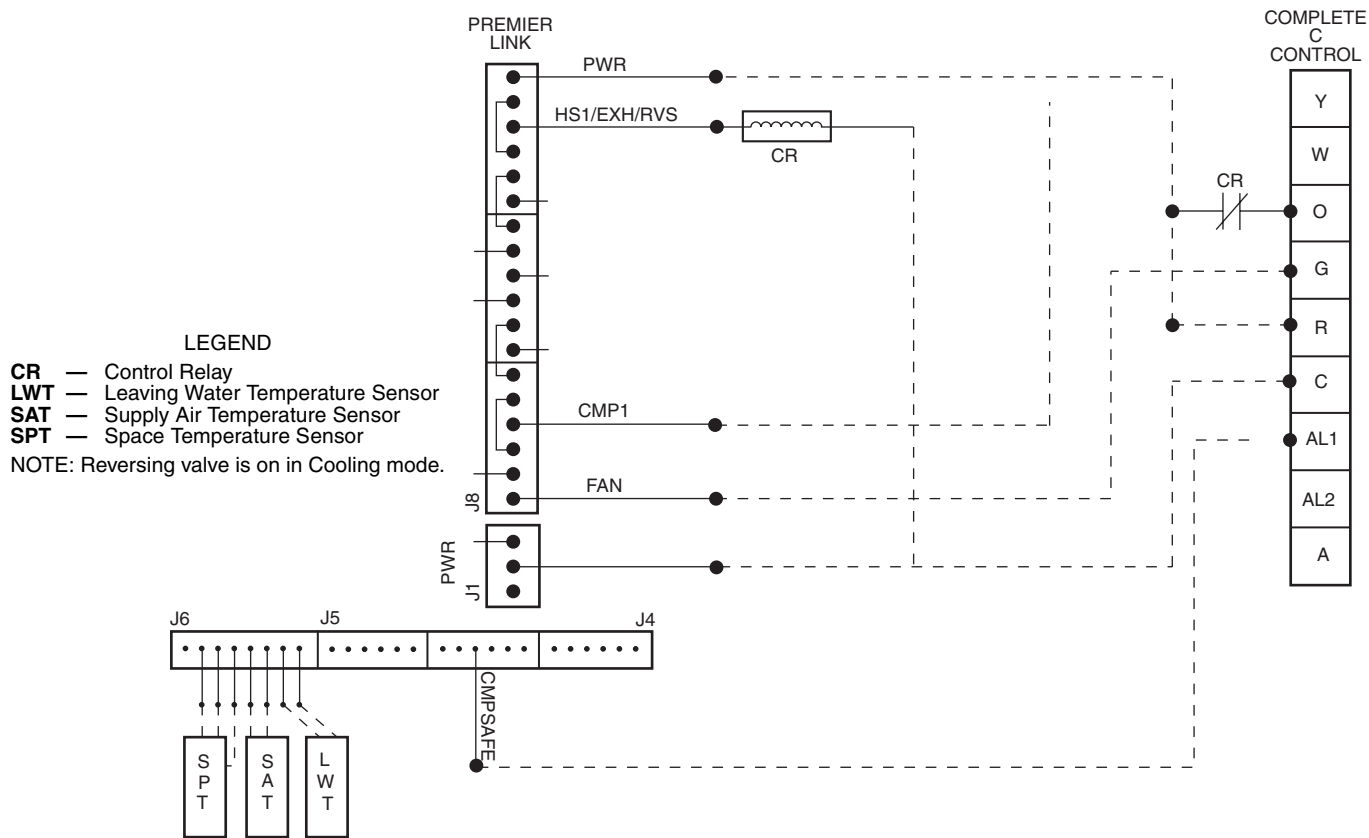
Remote Mounted Thermostat with Complete C Controller Wiring
